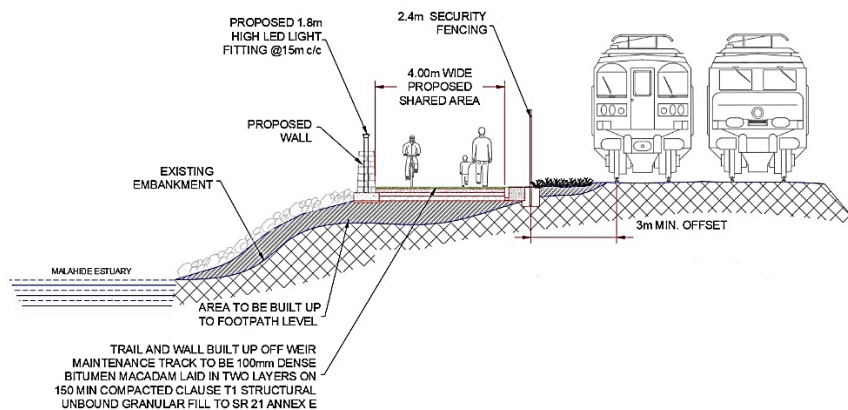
Cross section of the Proposed Greenway at the Causeway Embankment
